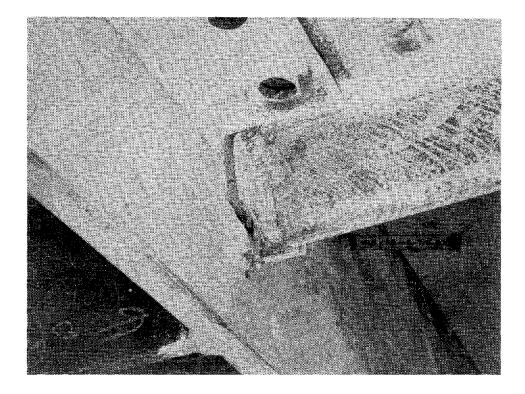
Failure of W18 x 50 Specimen by Beam Flange Pull-out from Column Stub.
